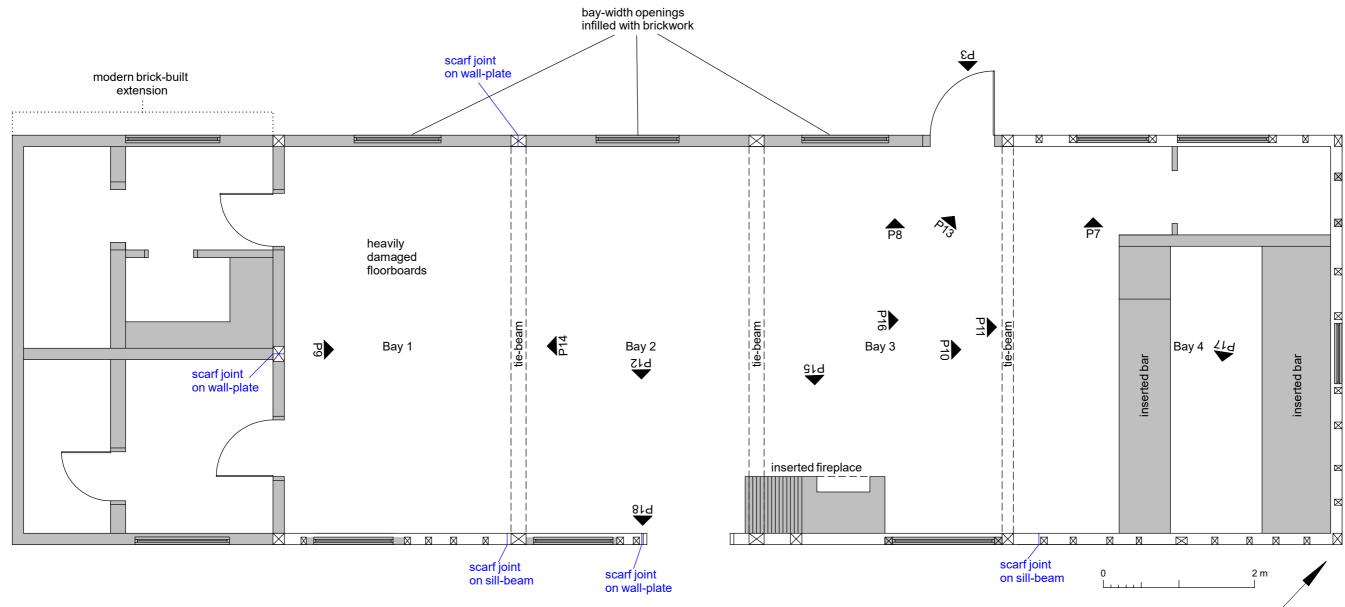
Floor-plan of outbuilding with phasing, showing location and direction of photographs reproduced in text.
